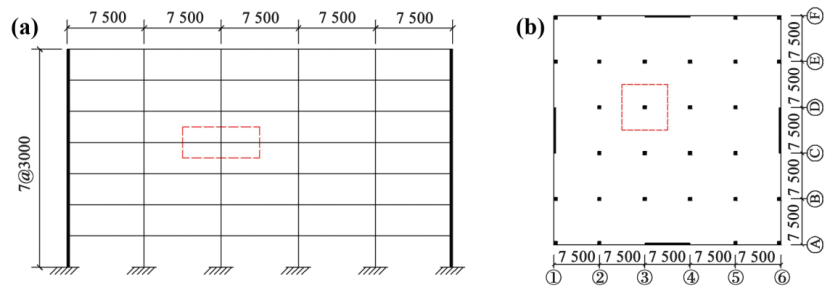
Prototype building [53]: (a) elevation; (b) plan.
